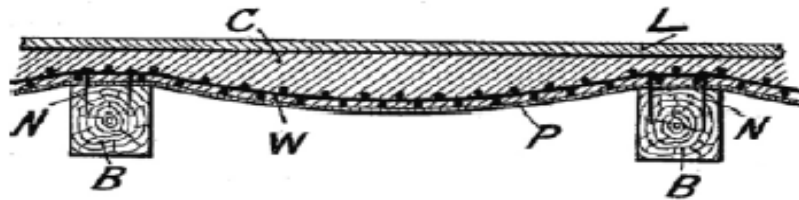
Fabric-formed floor system (Lamberton, 1968)
